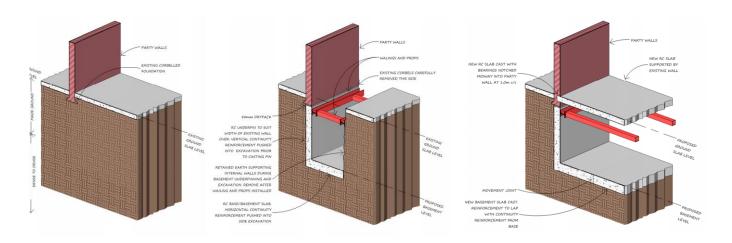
Typical construction sequence for underpinning of loadbearing walls
